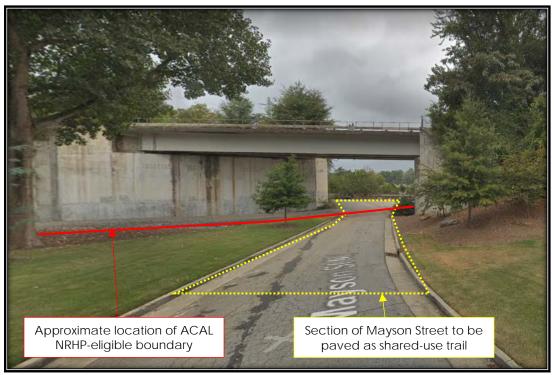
View along Mayson Street NE towards the section to be paved as part of the shared-use trail, facing west. <u>Source</u>: Google Street View.
